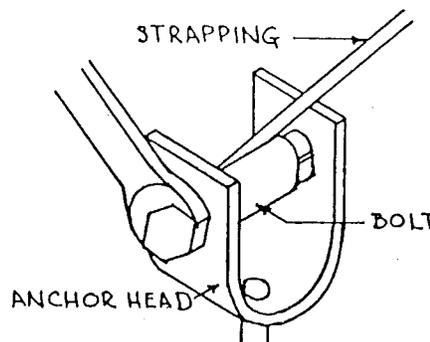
Tension bolt in anchor head, with strapping inserted and wrapped ready for final tightening.
